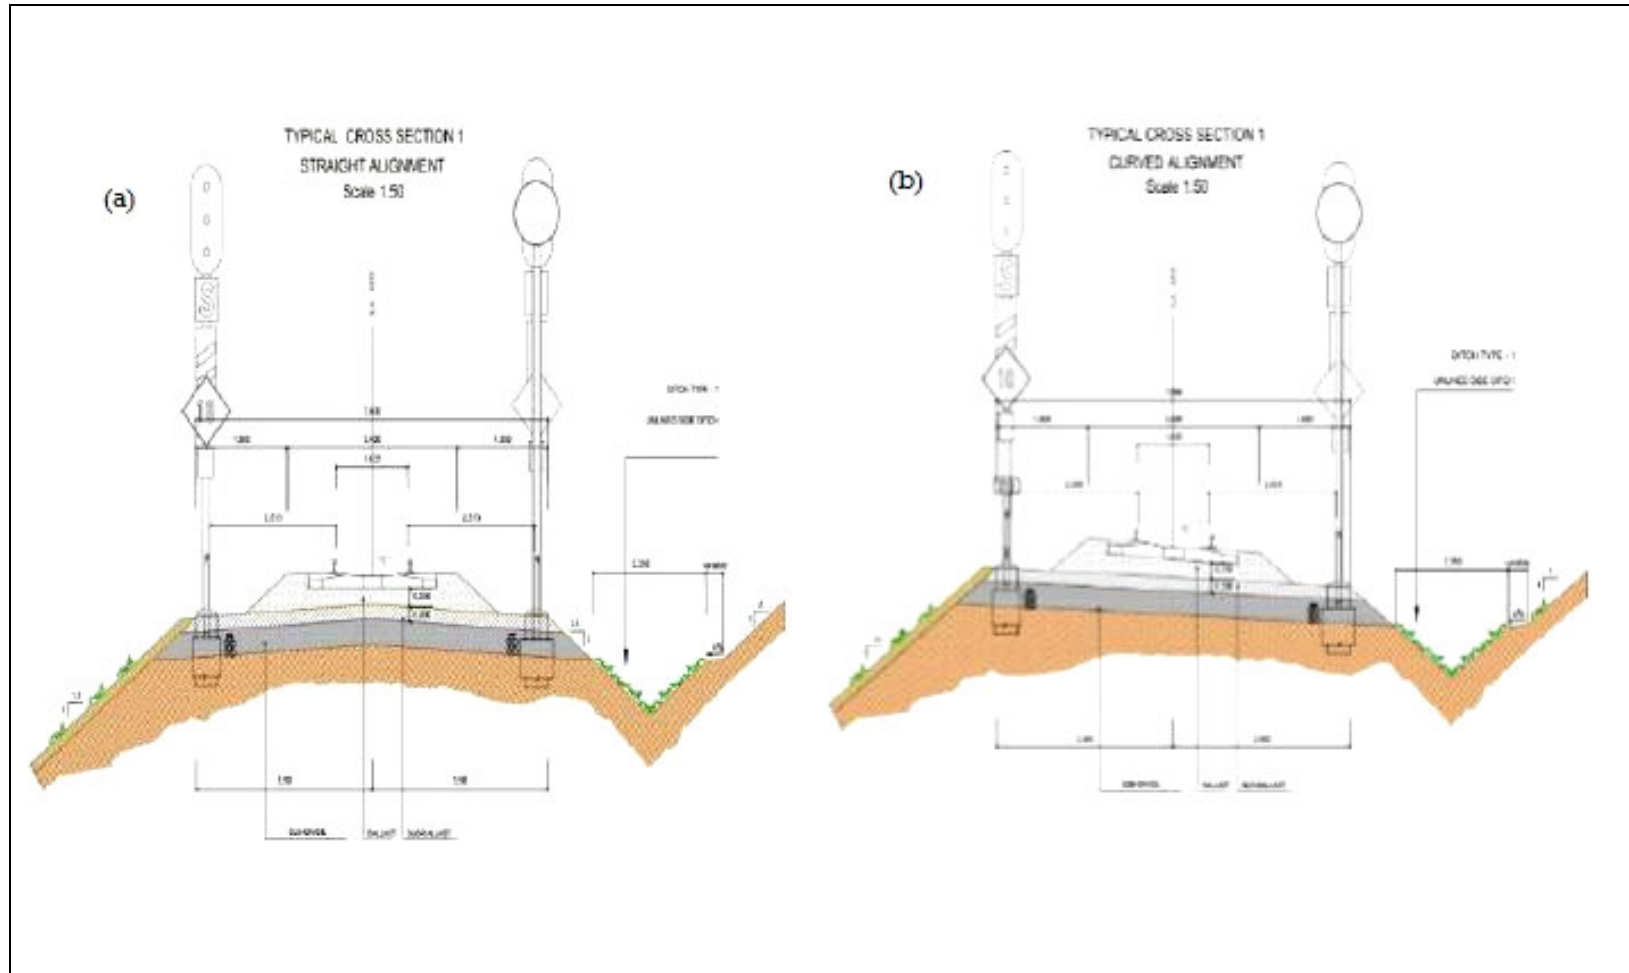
2: Typical cross-section of a straight alignment (a) and curved alignment (b)
